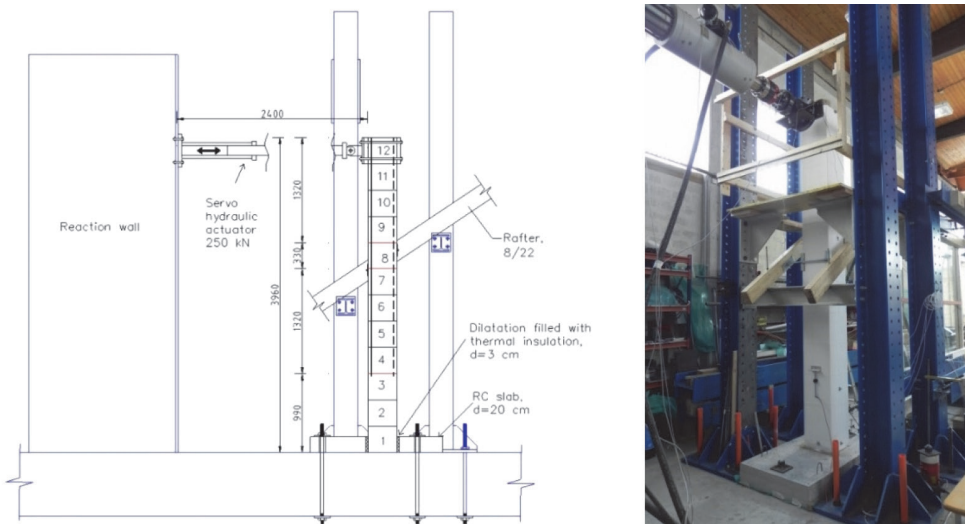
Test setup for laboratory testing of contemporary masonry chimney system with lateral force (left) and picture of test setup from laboratory prior testing
